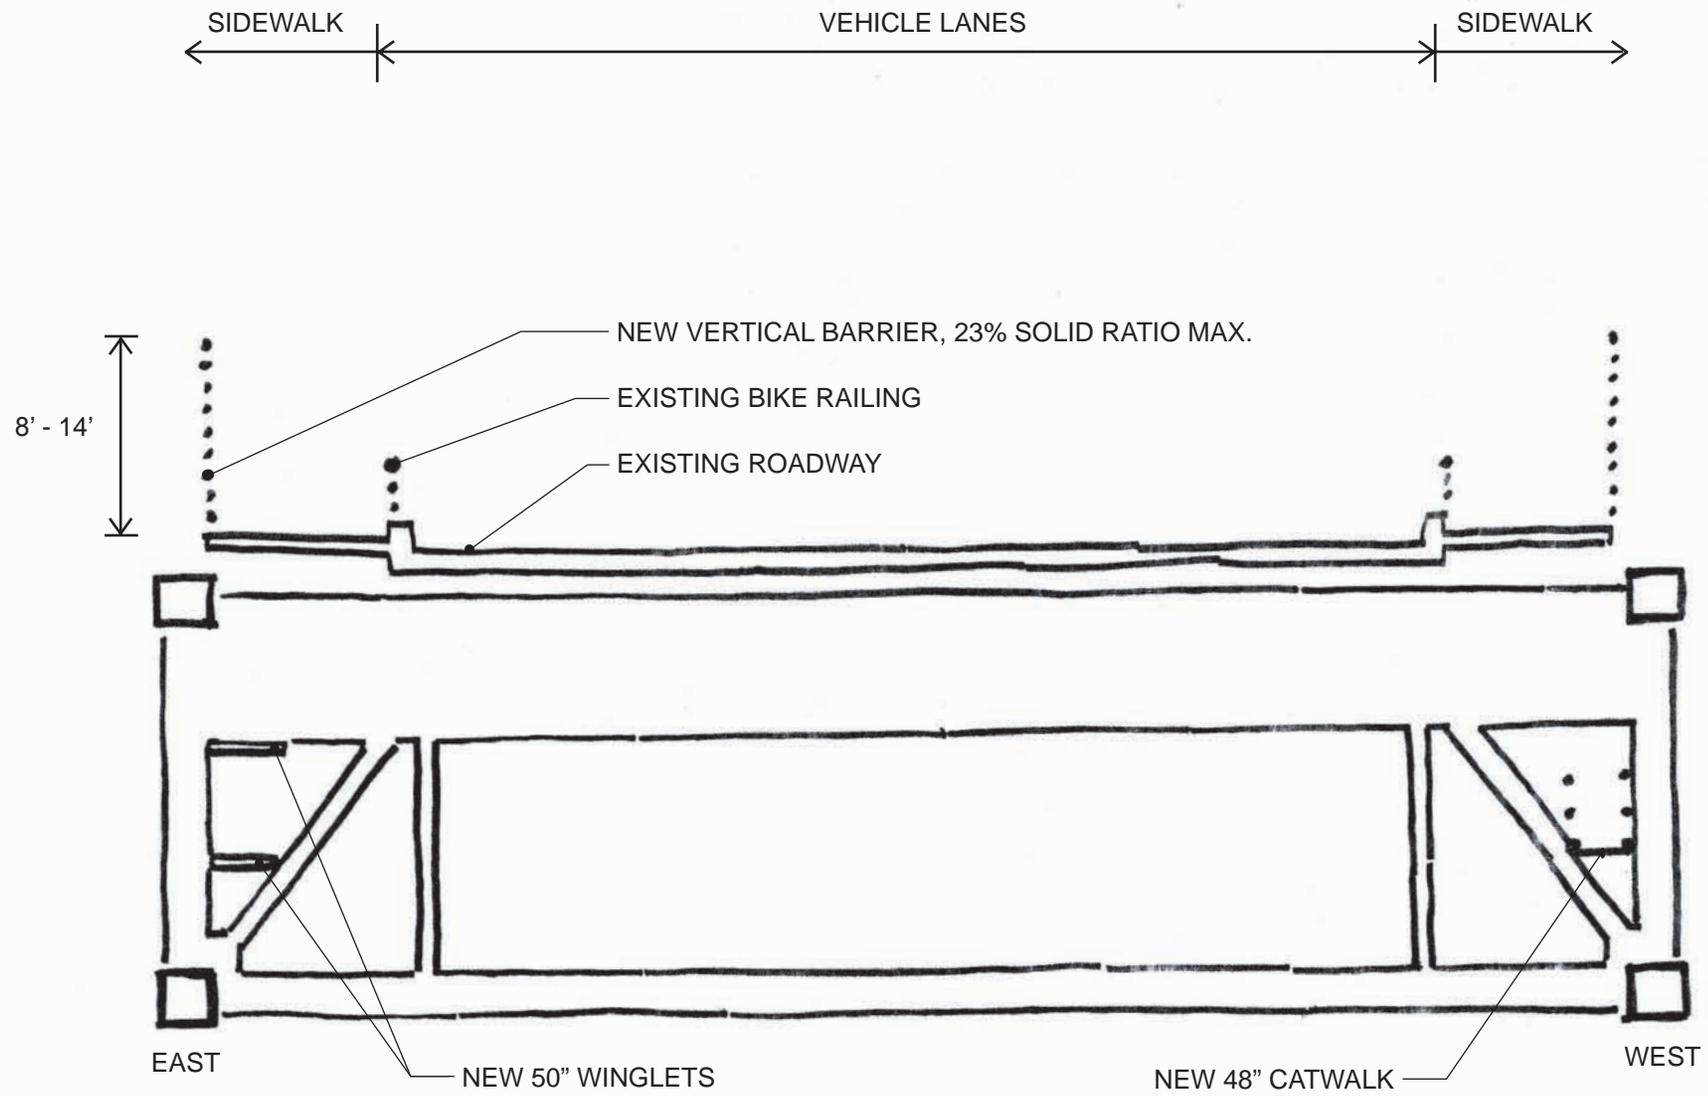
CONCEPT 2 : REPLACING THE EXISTING RAILING; WINGLETS UNDER DECK
